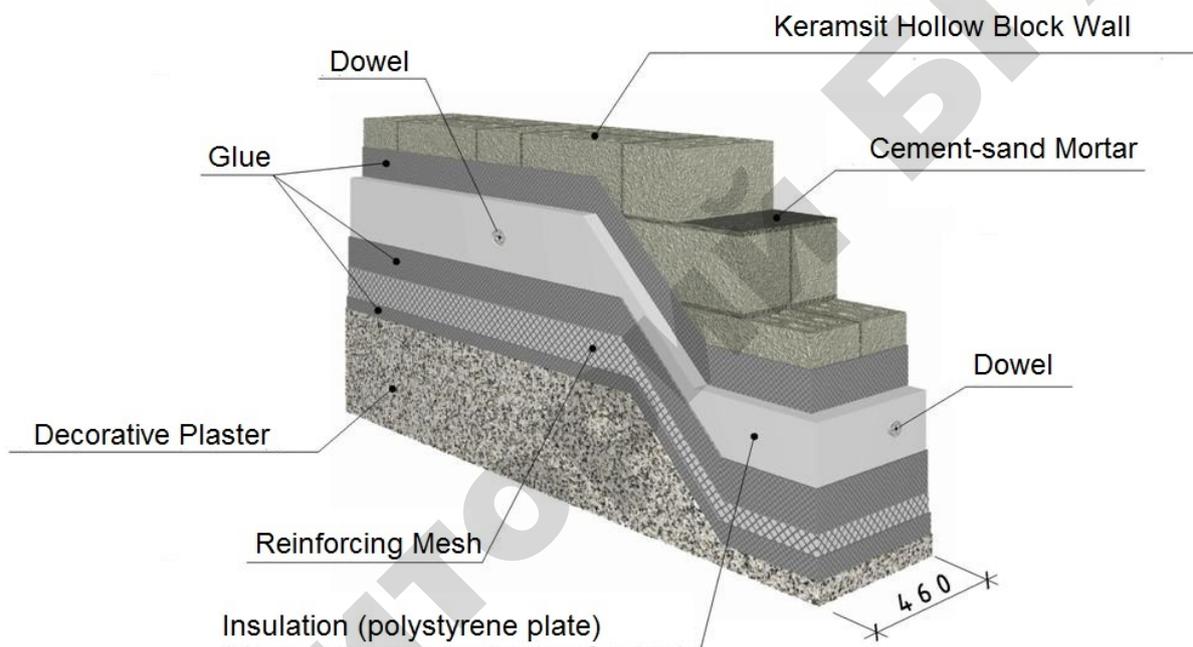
A modern building's wall covering based on technology “Thermoshuba”
